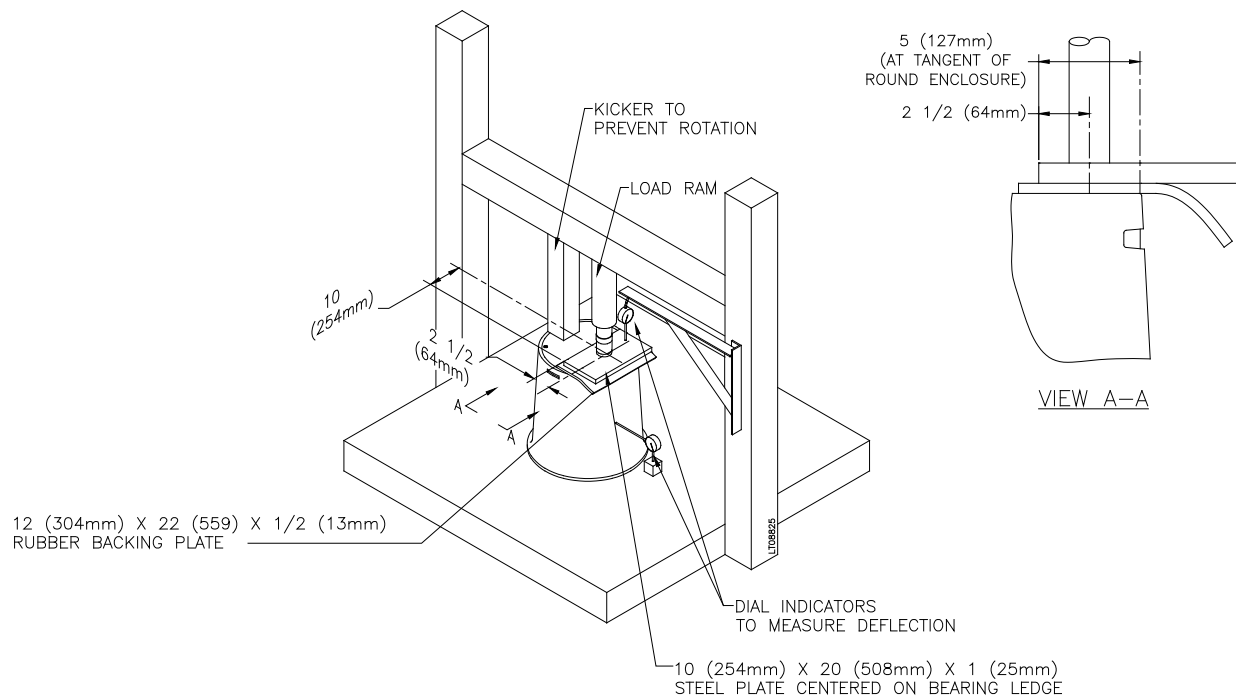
Box Vertical Sidewall Load Test (Tier 22)
